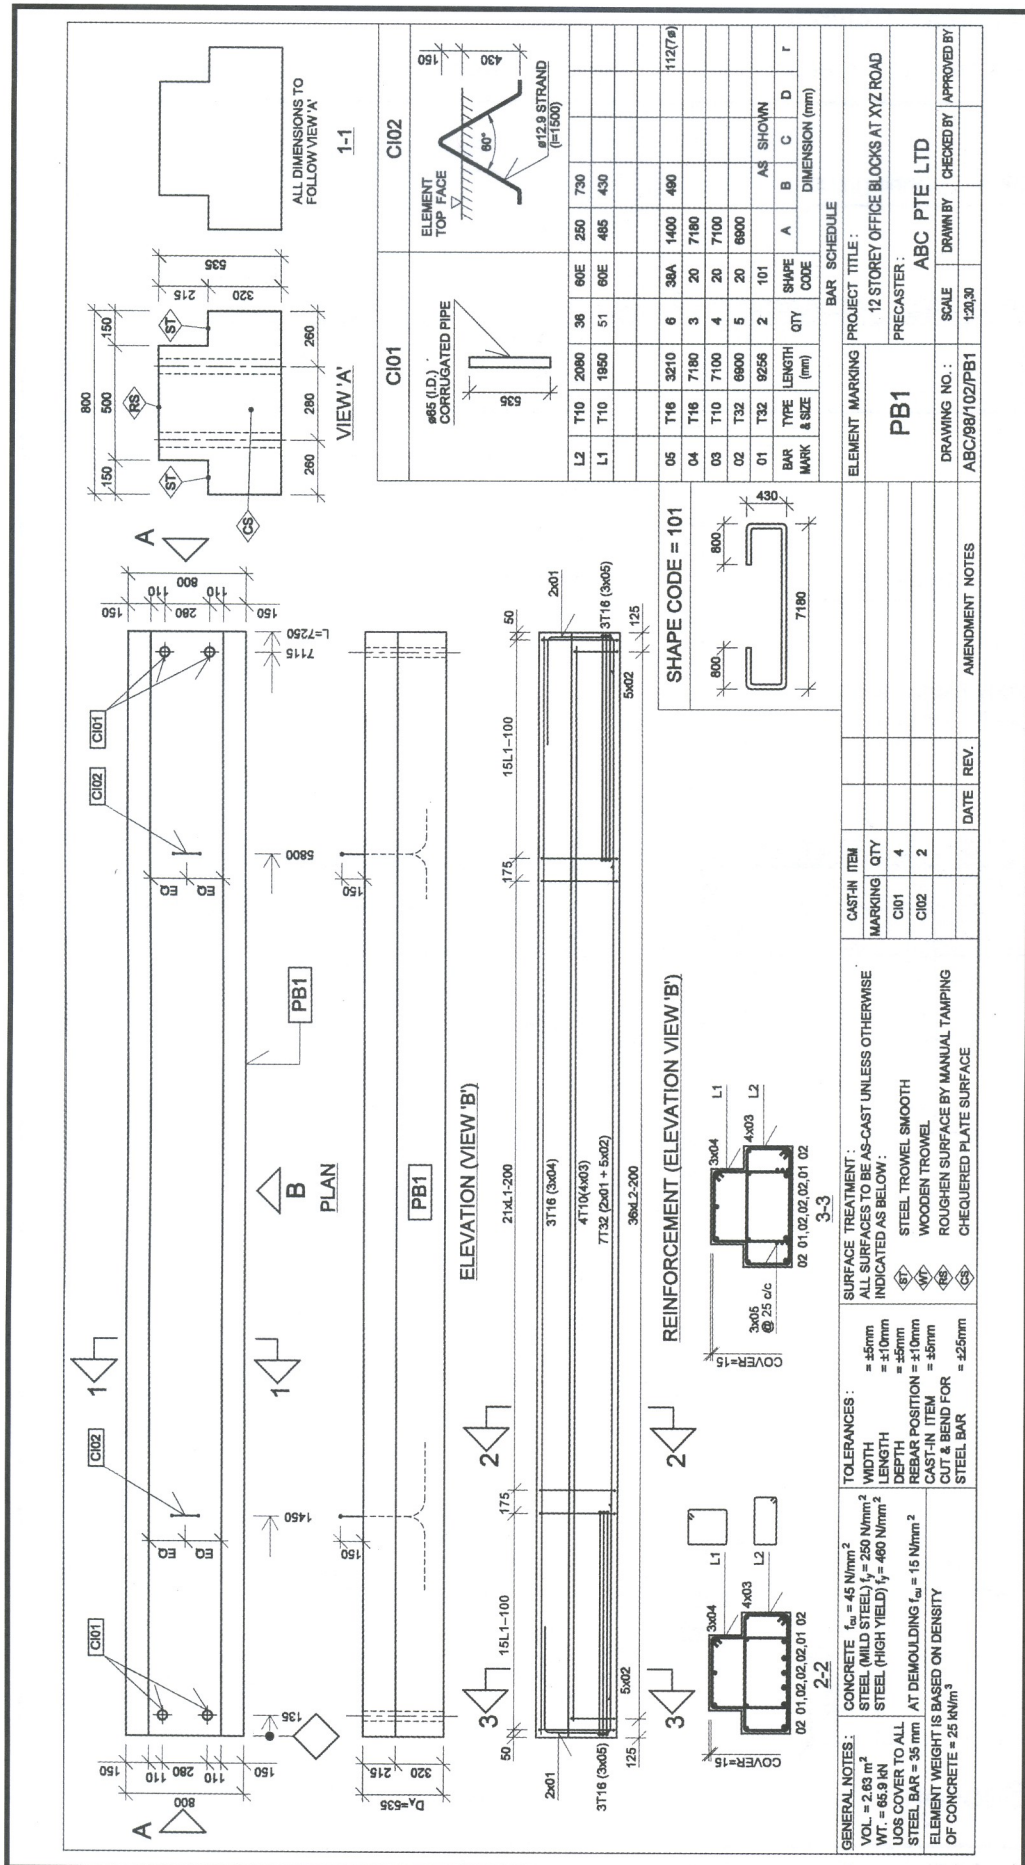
Production Details Of Precast Beam (12-Storey Office Block)
